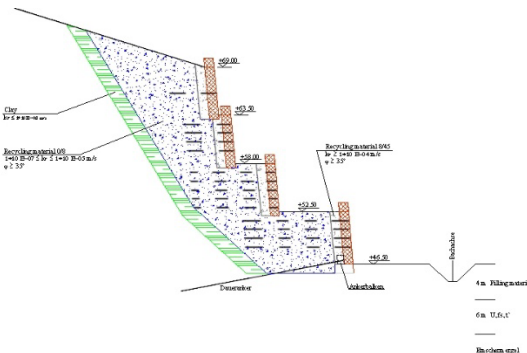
and 18: Covering dump Rheinelbe with soil and gabion wall (own pictures)
